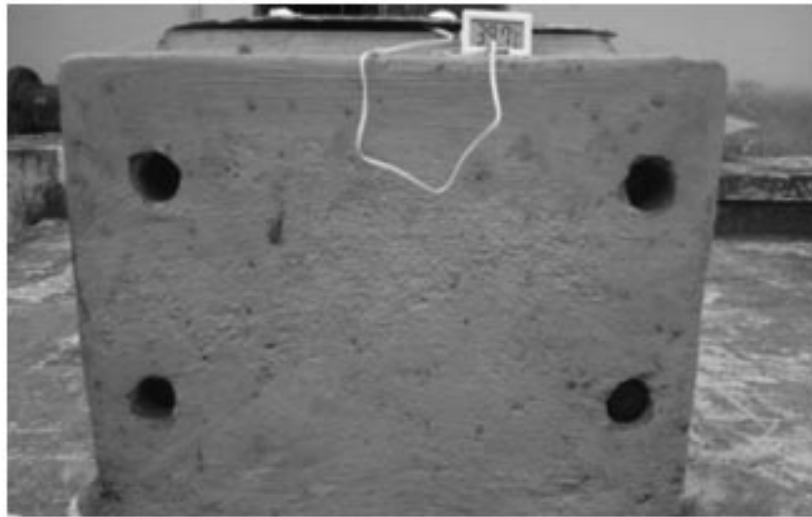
Building model setup PEG E600 integrated hollow brick walls covered by RCC Slab
